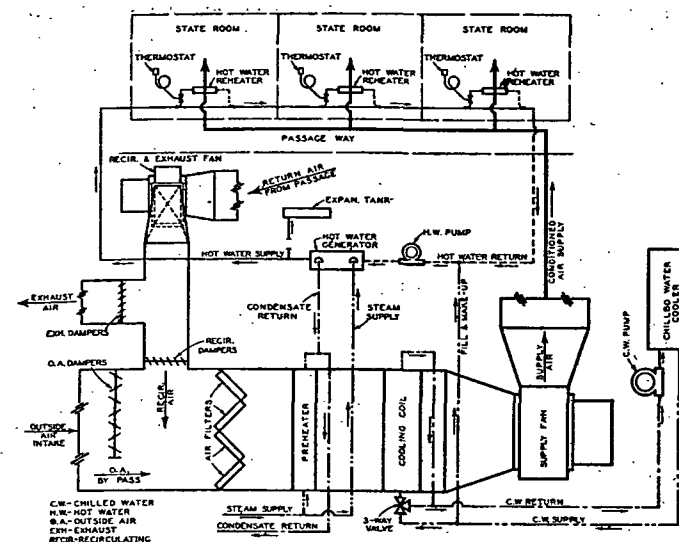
ARRANGEMENT OF AIR CONDITIONING SYSTEM WITH CENTRAL SUPPLY EQUIPMENT AND INDIVIDUAL HOT WATER ROOM REHEATERS
